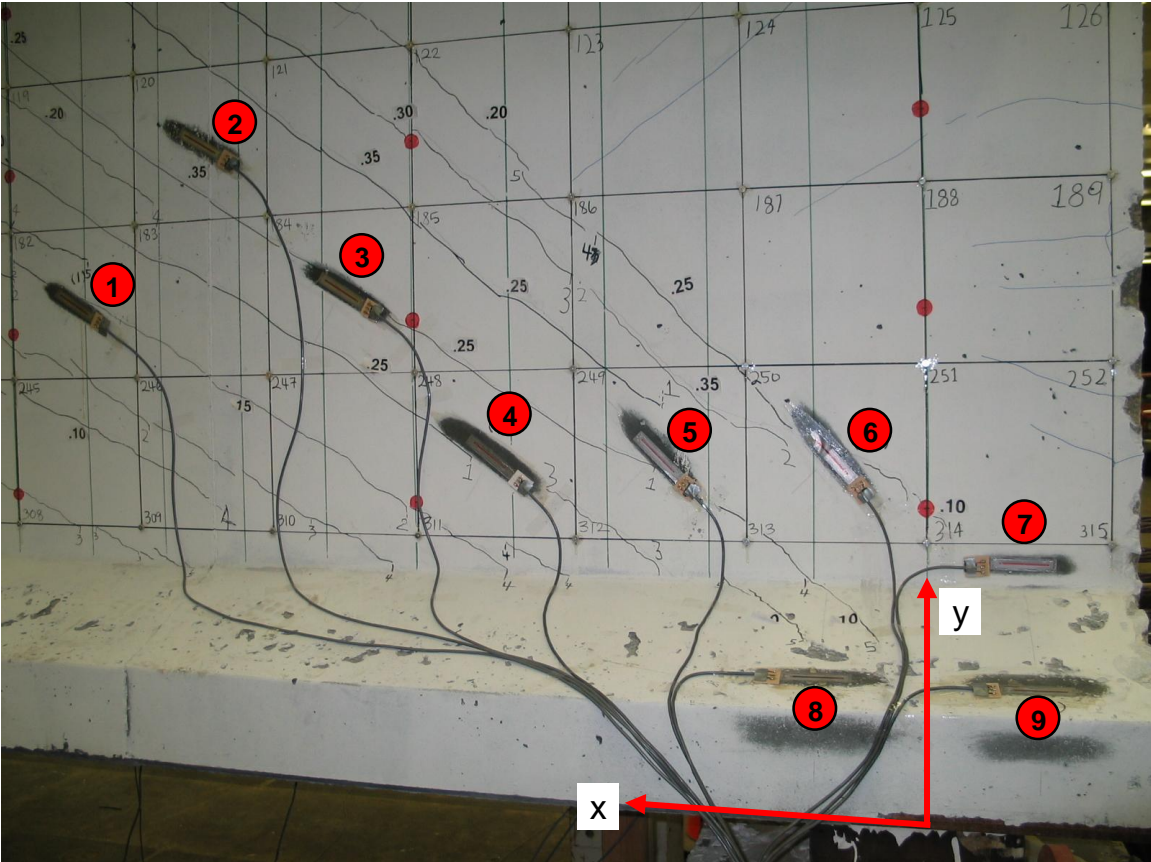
Concrete surface strain gauges on a prestressed concrete girder
